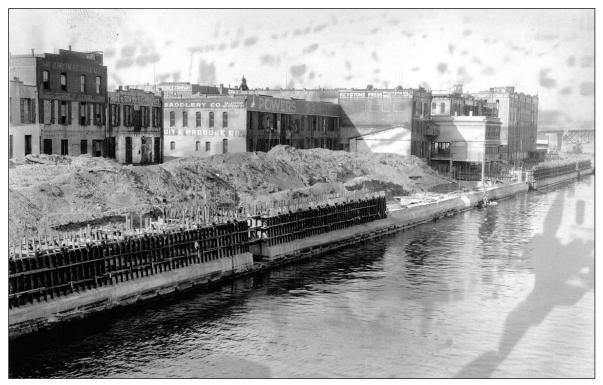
Construction in progress of Harbor Wall forms with view of debris on shoreline and reconstruction of rear wall of building damaged during dock removal on September 28, 1928.
